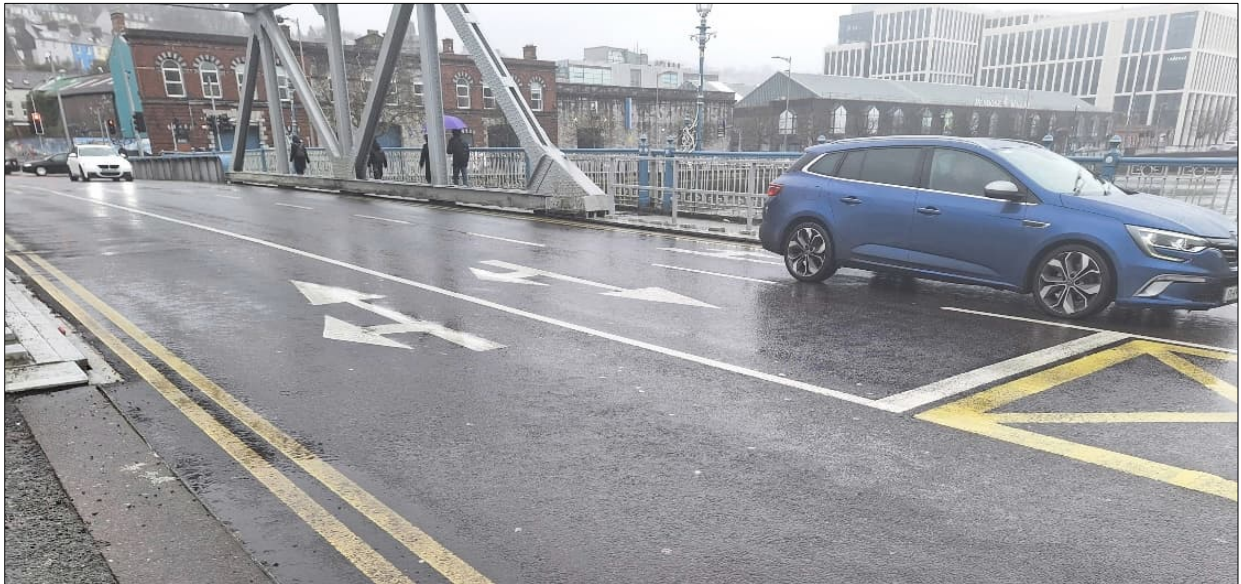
Brian Boru Bridge – Existing Configuration
